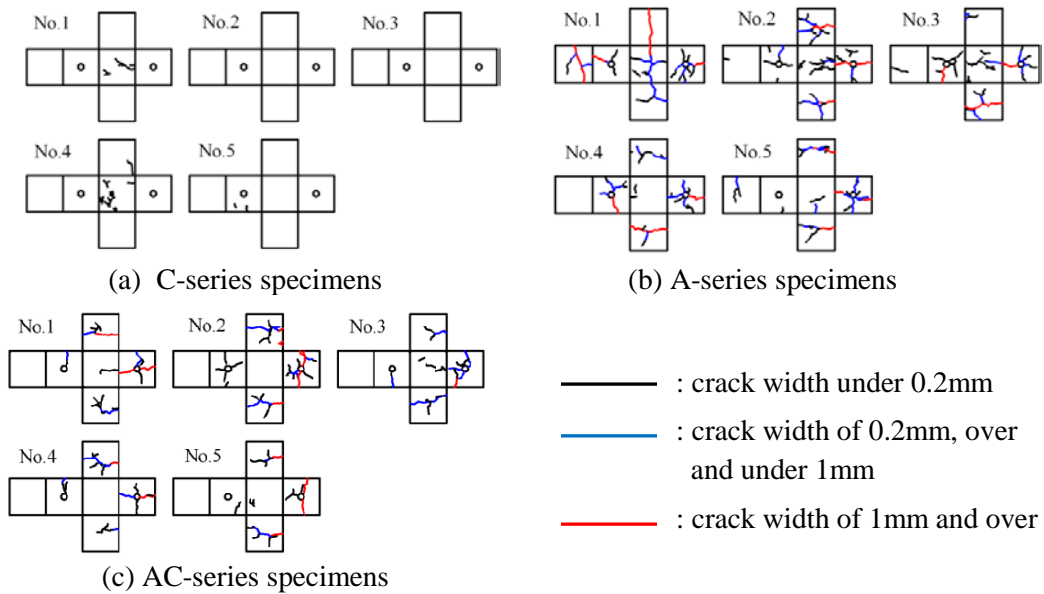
Condition of crack before loading tests (Type-1 specimens)
